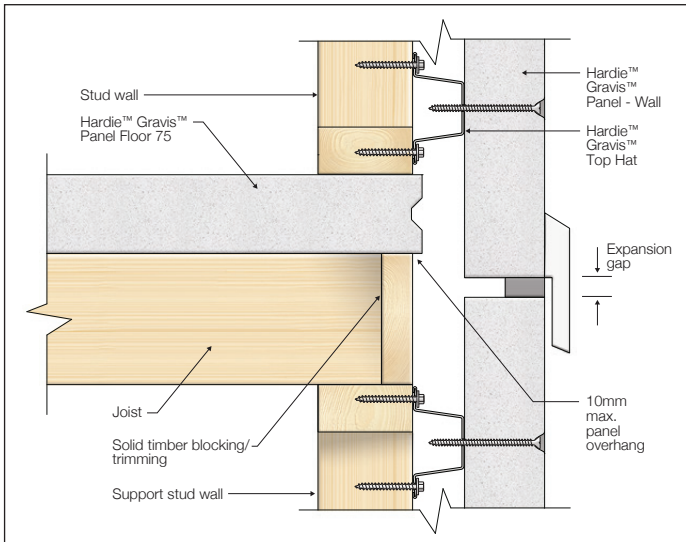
PLATFORM FLOOR WITH EXTERNAL LOADBEARING FLOOR
